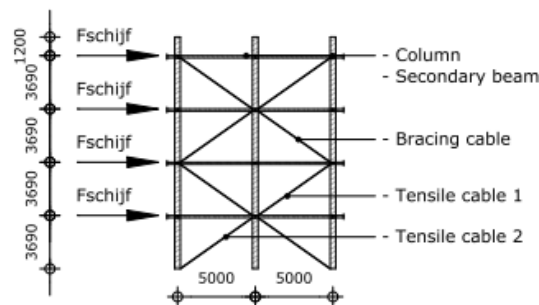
Transverse bracing system with indicated tensile cables in mm
